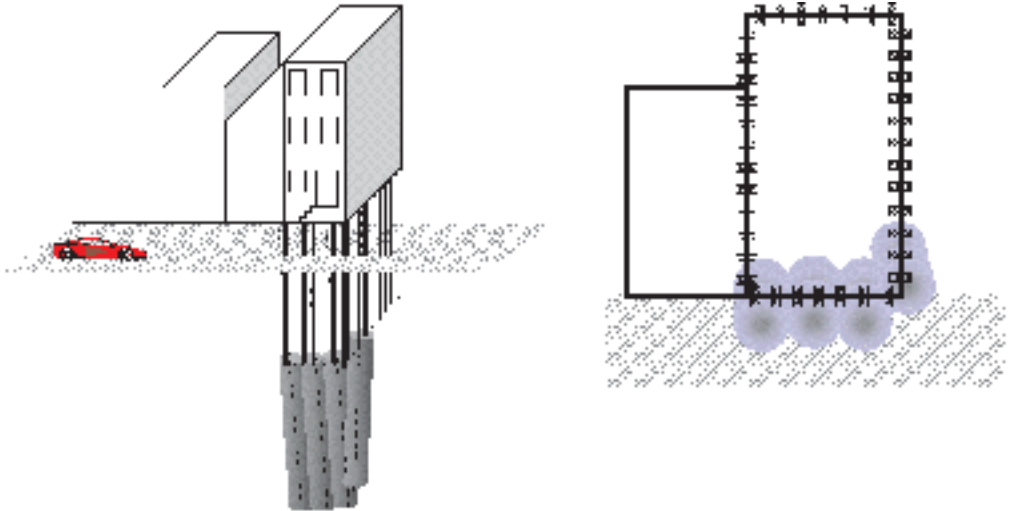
Example of Jet Grouted Piles to Extend a Pile Foundation
